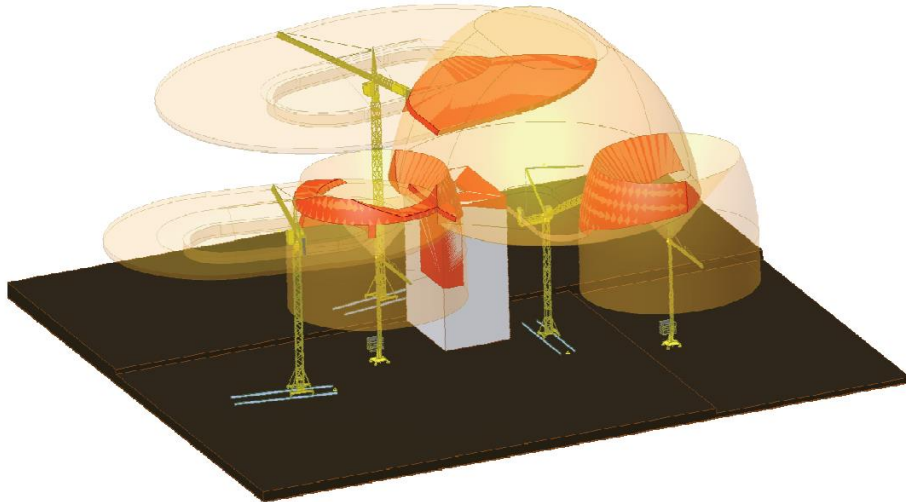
3D model shows potential collisions between cranes at the construction site. Source: (Ebner;Kammergruber;Horenburg;& Günthner, 2012)
